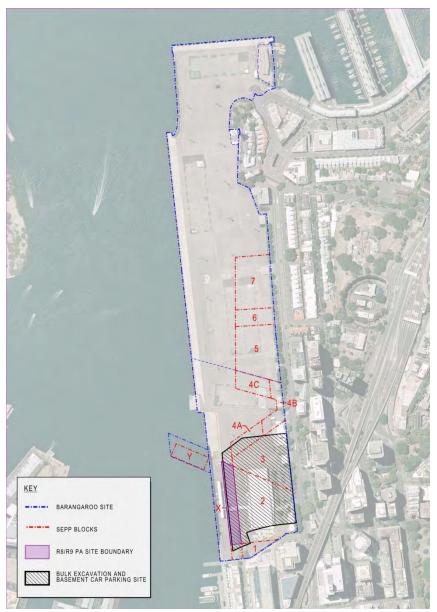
R8 and R9 Residential Building Project Application (MP11_0002) Aerial Site Location Plan
